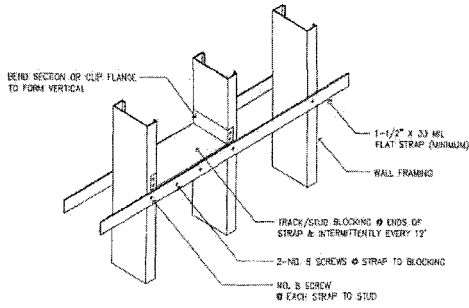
Stud Bracing with Strapping Only (AISI 2002d)
